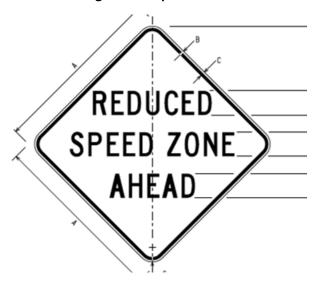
W3-5 Sign to be used in place of W3-5b sign.
